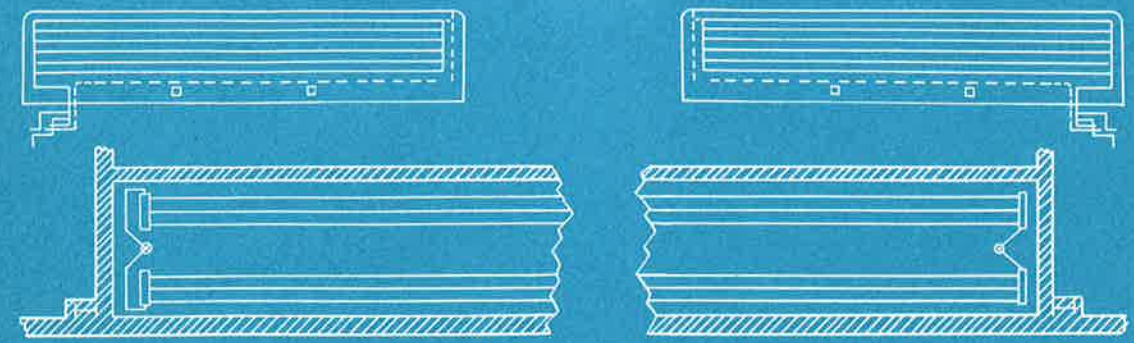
Upper diagrams show pipe layout of marquee installation, lower diagrams of roof installation, at Peoples Savings Bank.
